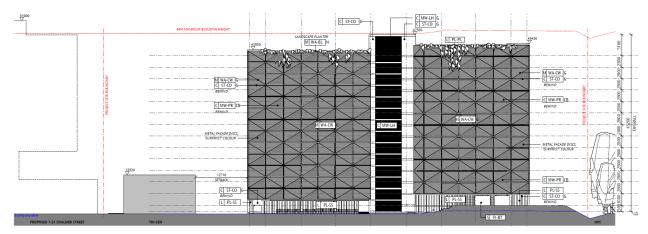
General Arrangement – Elevations – West Elevation – Car Park
